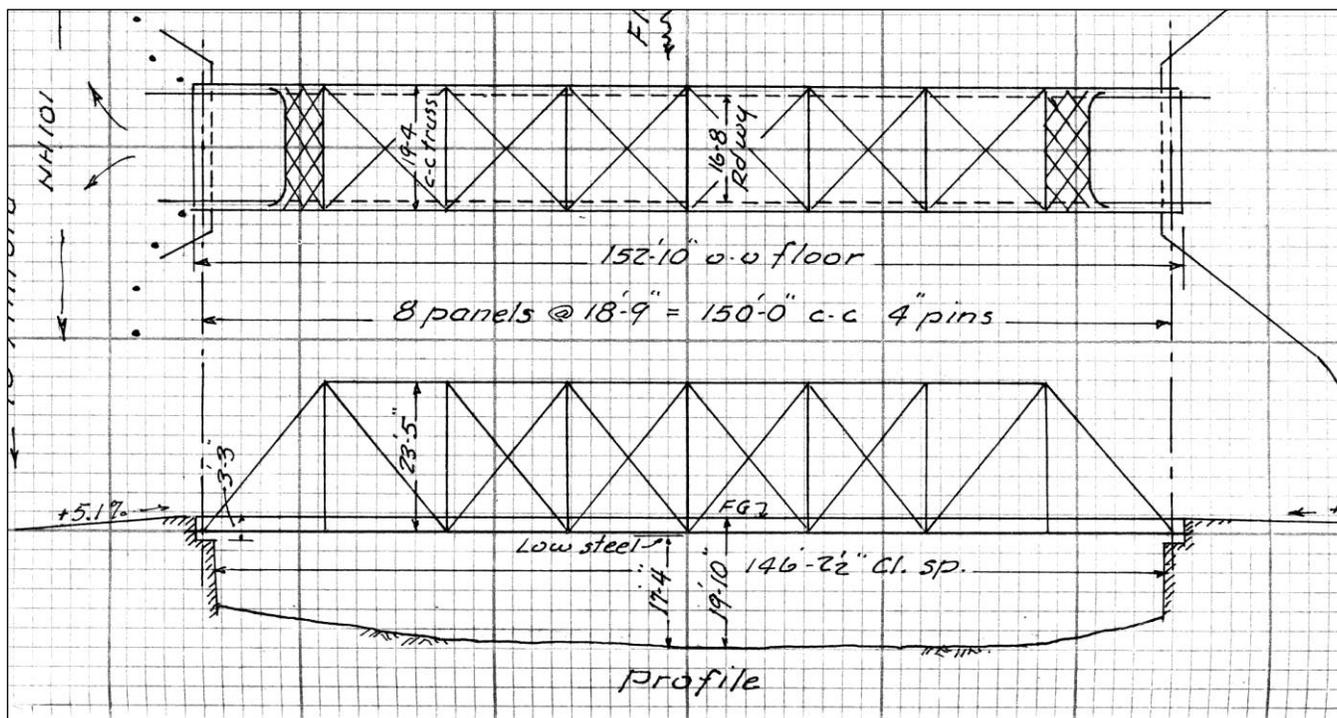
Milford 062/138, Jones Crossing Bridge over Souhegan River. Plan & elevation sketch (NHHD Bridge Inventory Card).
